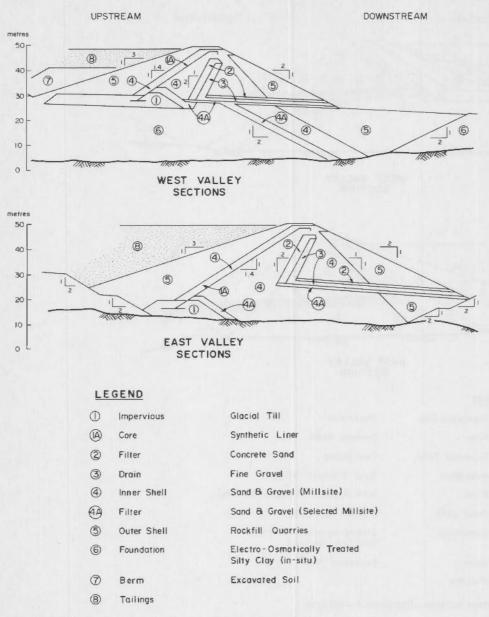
Embankment cross sections alternative 2—synthetic liner.
